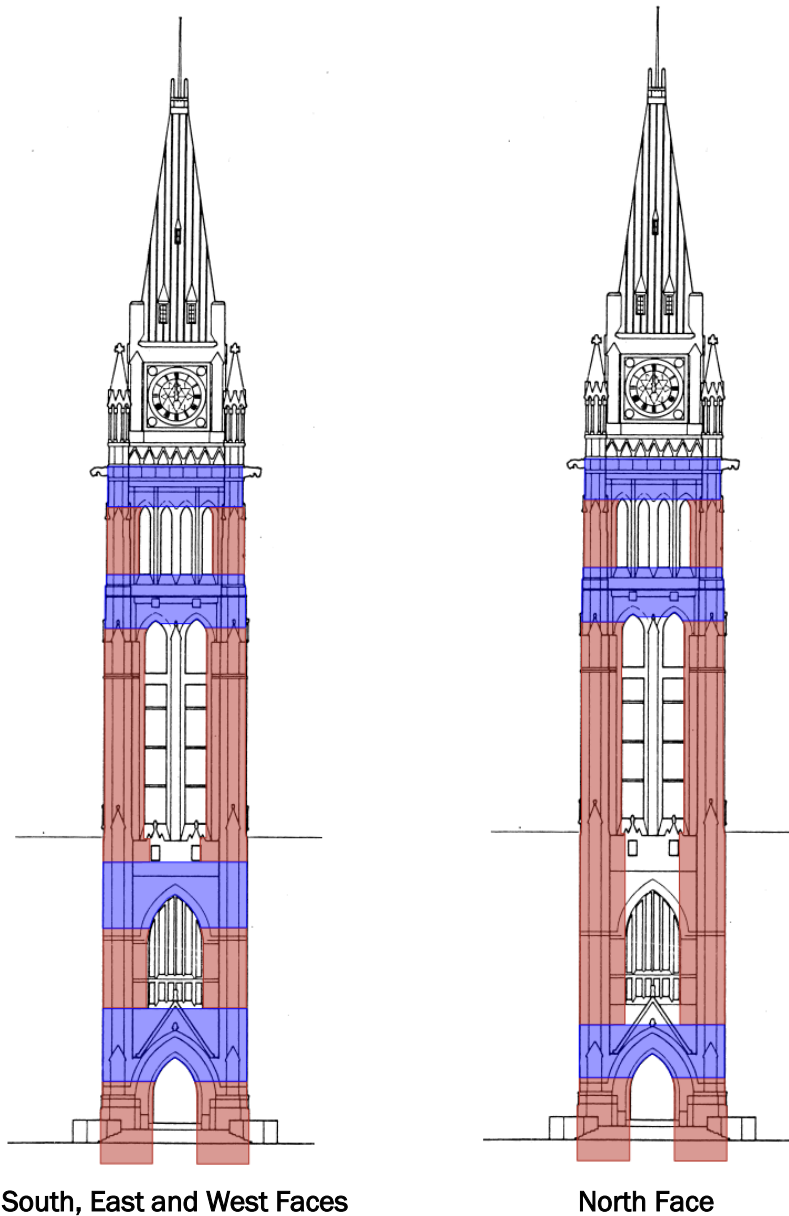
Piers and spandrel beams highlighted on Peace Tower elevations
